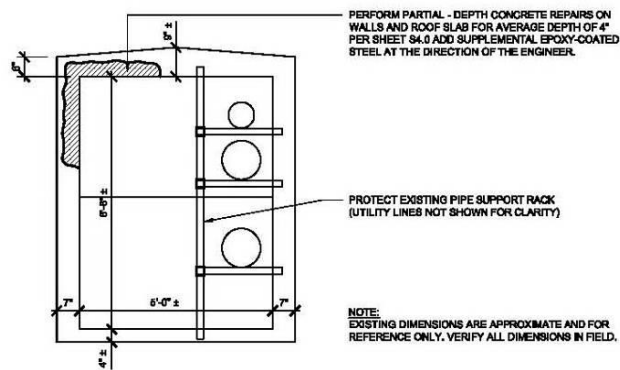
Repair Option 1, partial depth interior repairs on walls and ceilings
